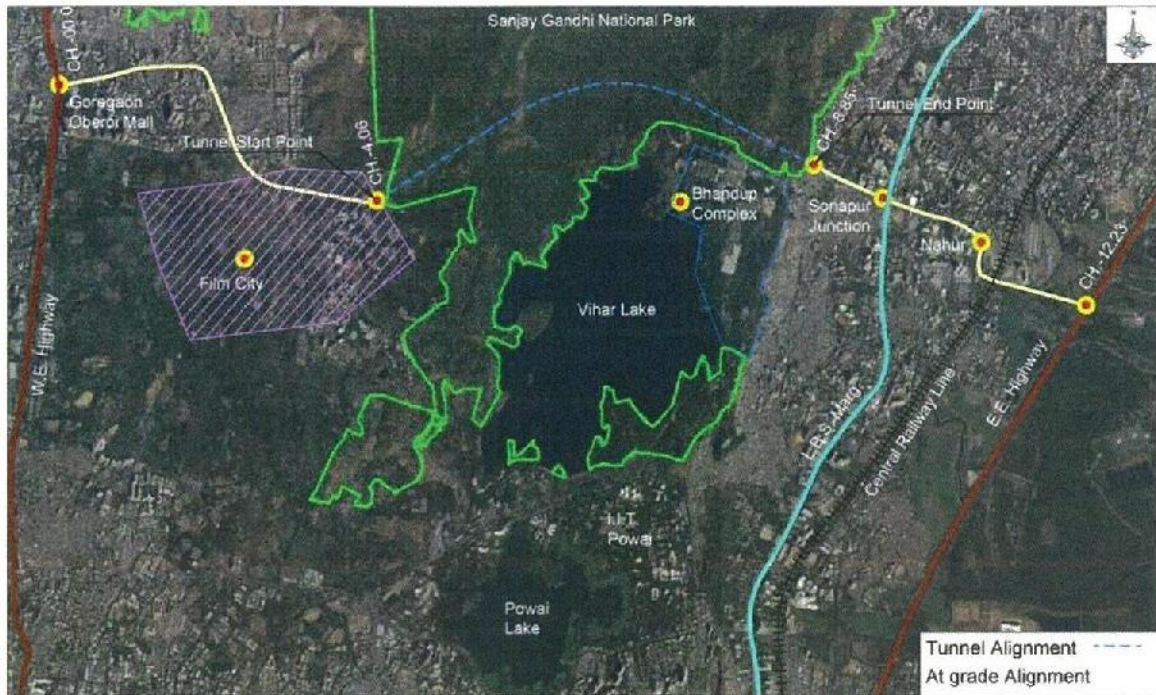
GMLR Proposed Tunnel Alignment Option by M.s Padeco Co ltd
